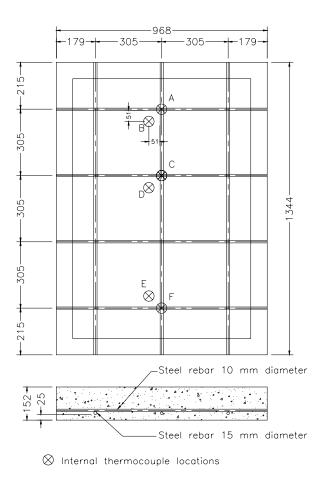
Slab dimensions and reinforcement details for a typical test slab (refer to Table 1)
